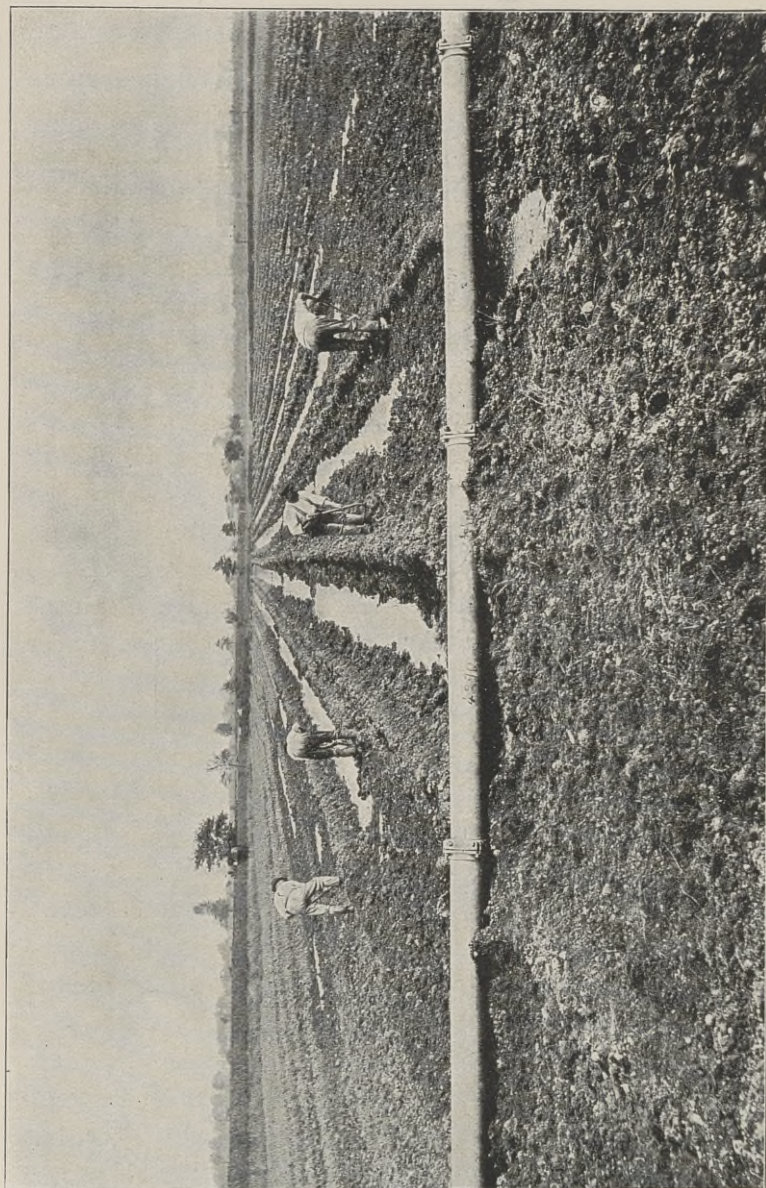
Method of Burying Sewage Sludge in Trenches, Showing Portable Distributing Pipes.
